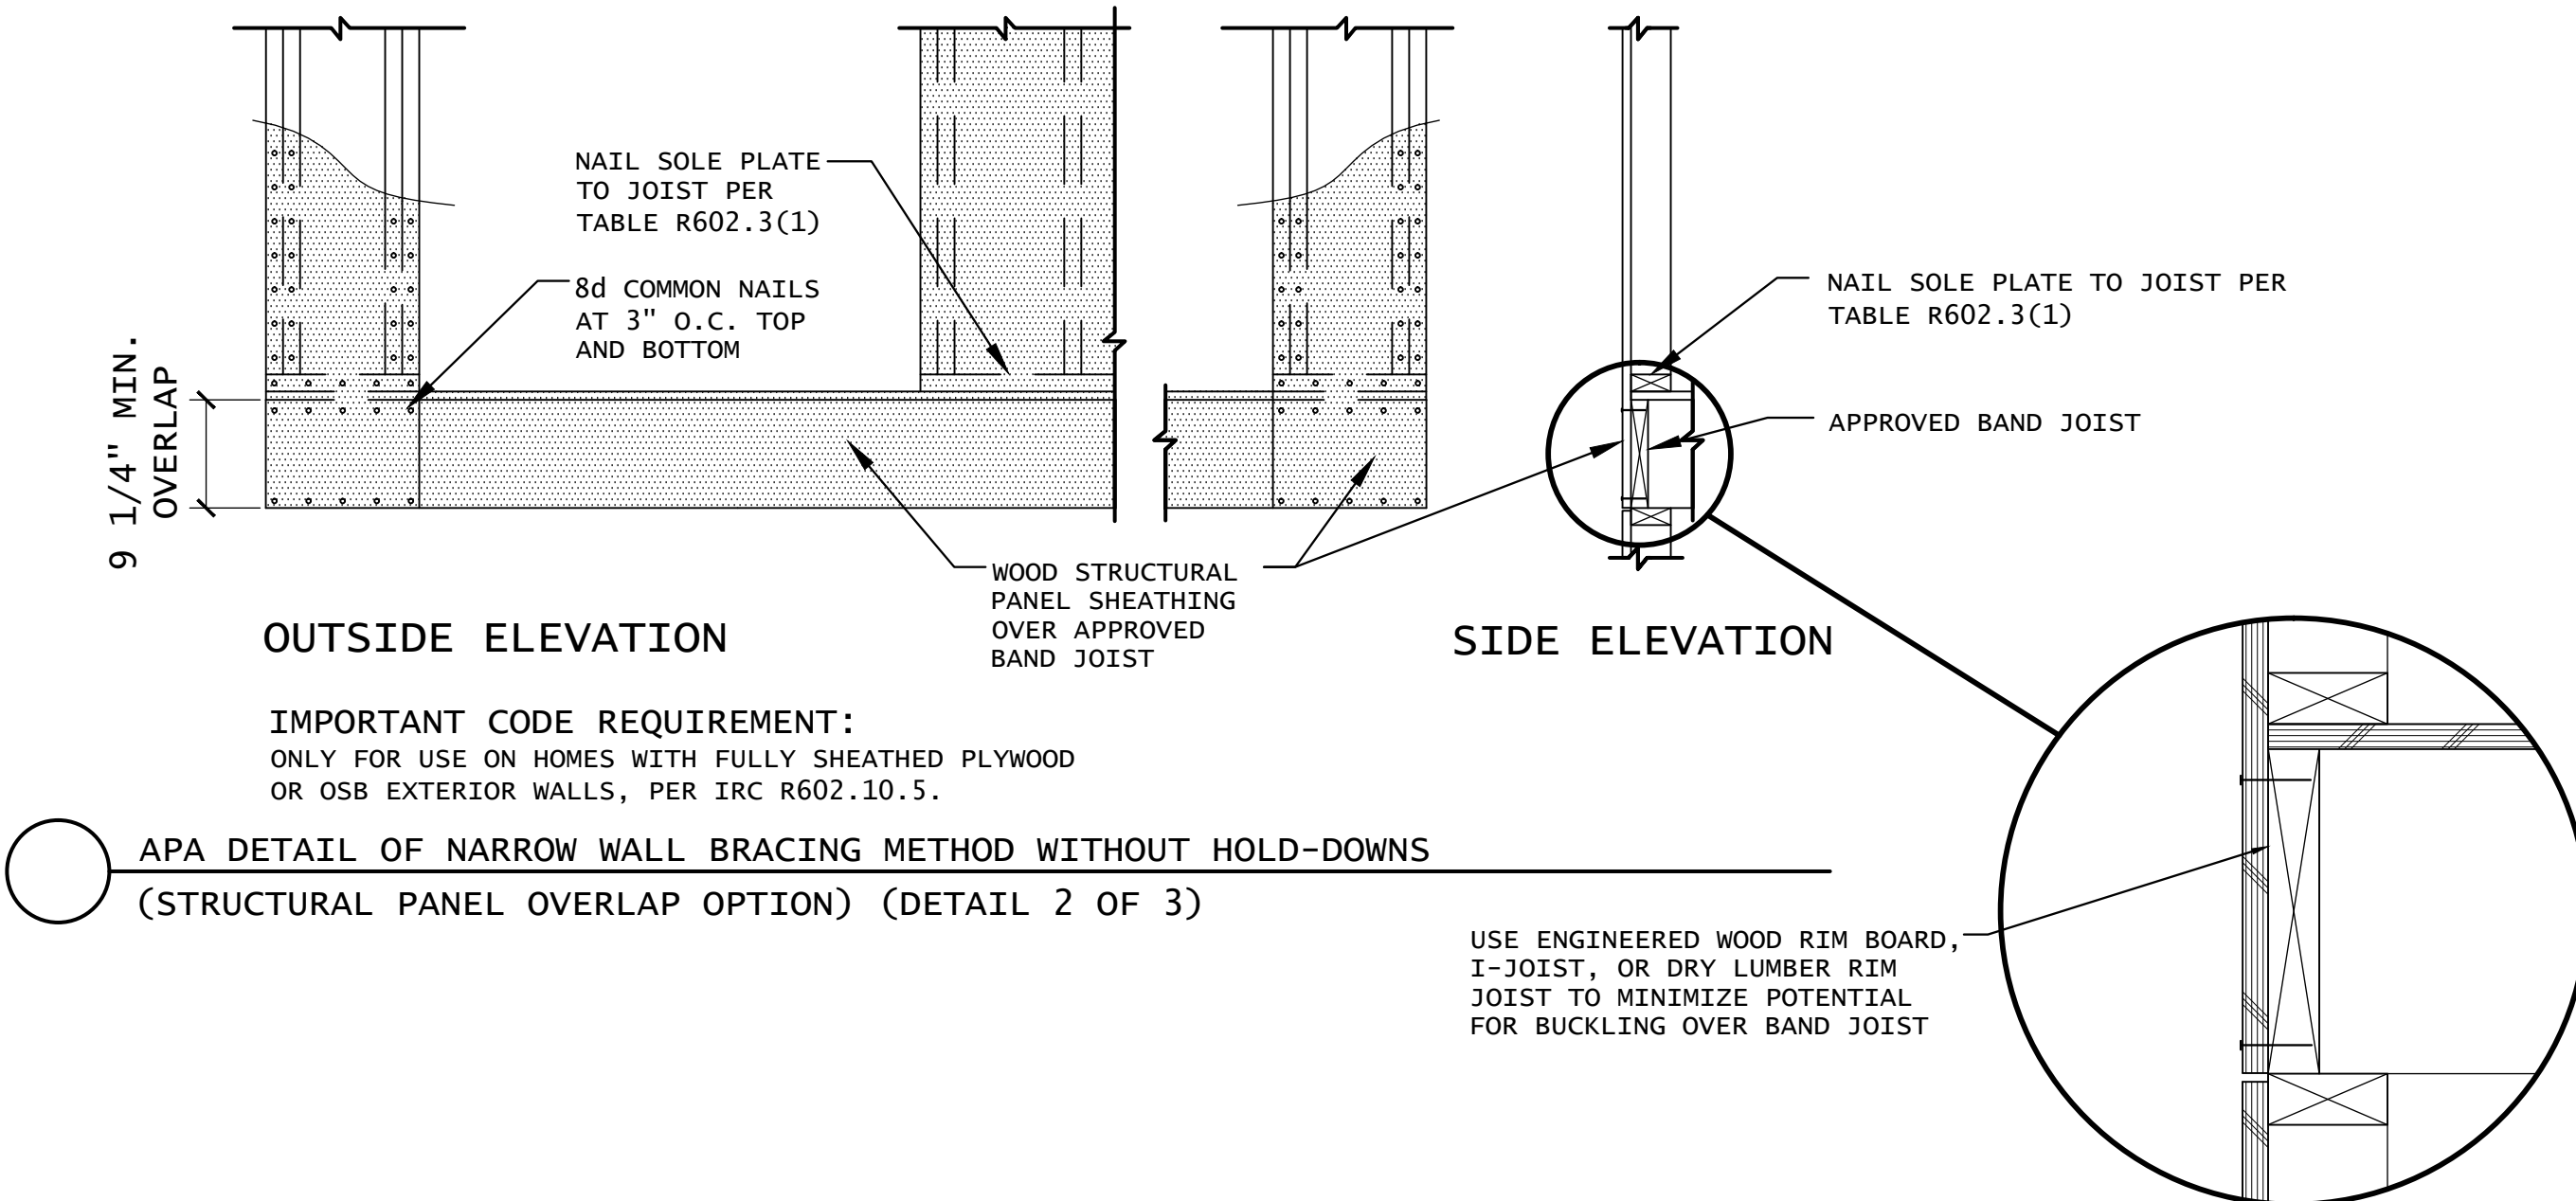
CONTINUOUS SHEATHING BRACED WALL
